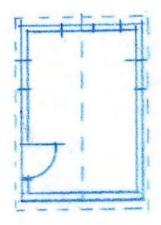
Floorplan of workshop sketched by Geoff Ashley (2016, p32).
